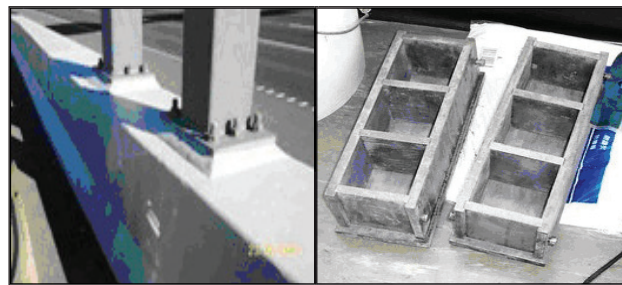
Grouting beneath base plates of sign structures (L), Steel cube moulds for sampling mortars and grouts (R)
